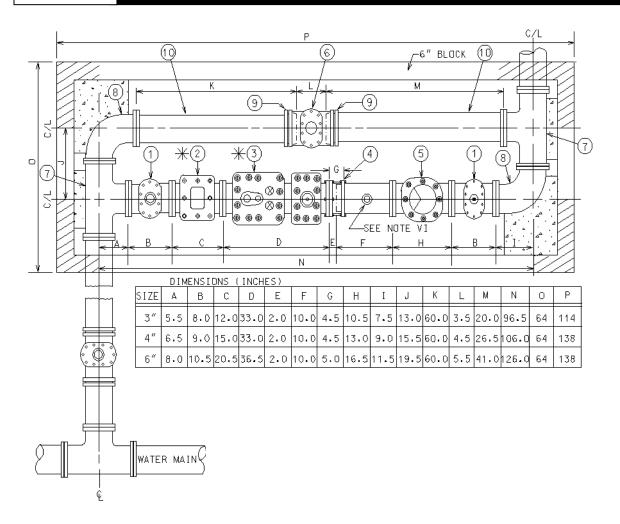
Typical Installation of 3", 4" and 6" Service With Flanged Coupling Adapter
